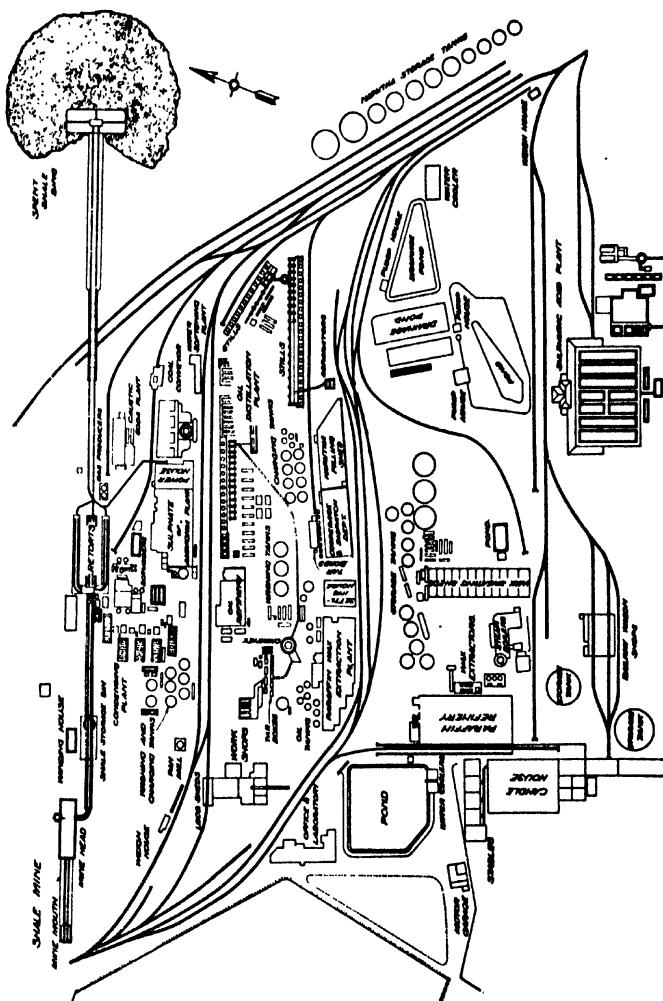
Plan of typical Scottish oil-shale retorting and shale-oil refining works.
